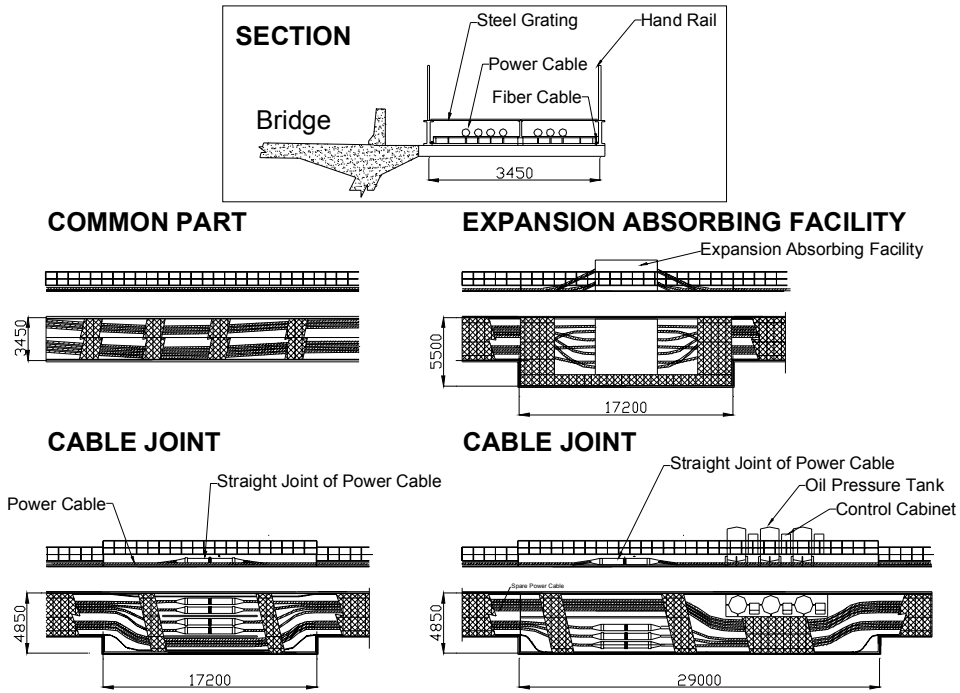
Arrangement of Power Cables on Cable Tray
